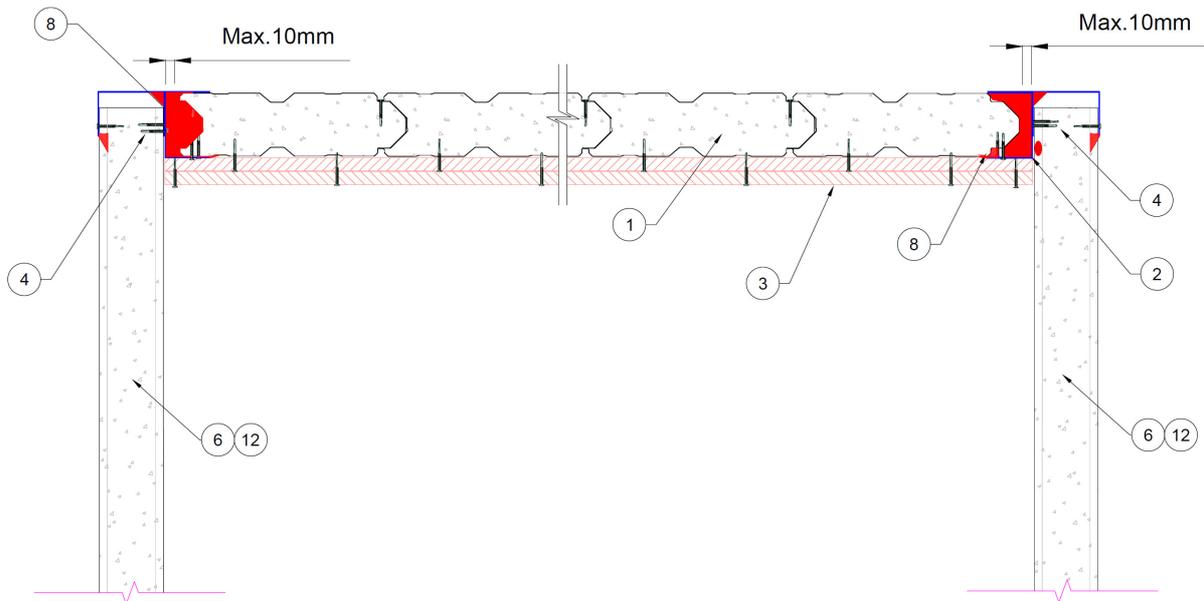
Speedpanel ceiling protected with plasterboard linings (Cross Section View)
